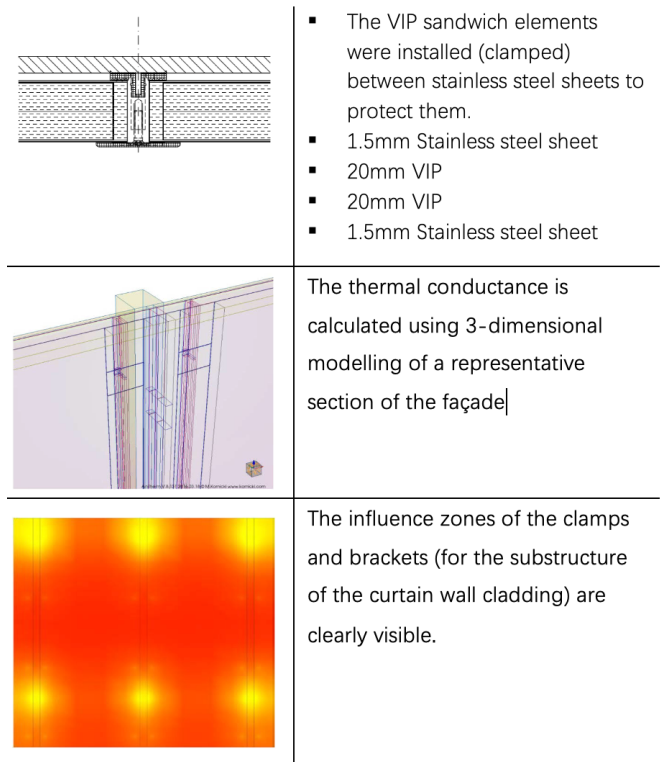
Section of the wall structure, Source: Amstein+Walthert AG
